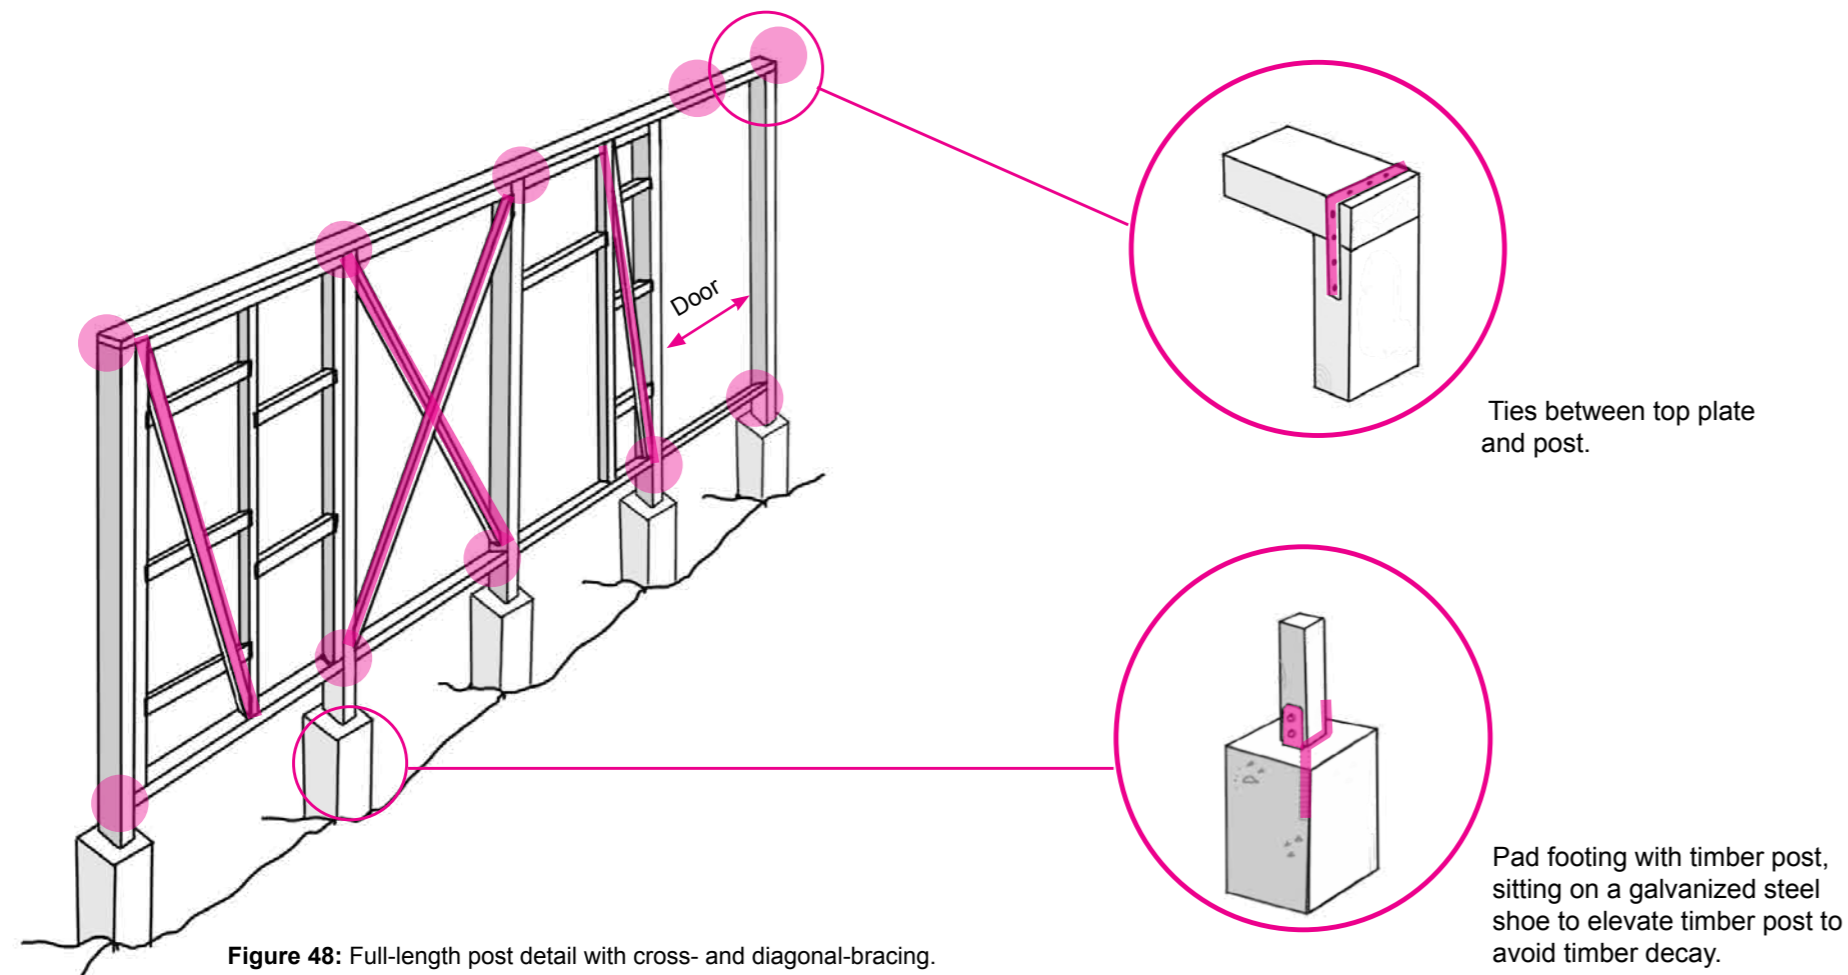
Full-length post detail with cross- and diagonal-bracing.
